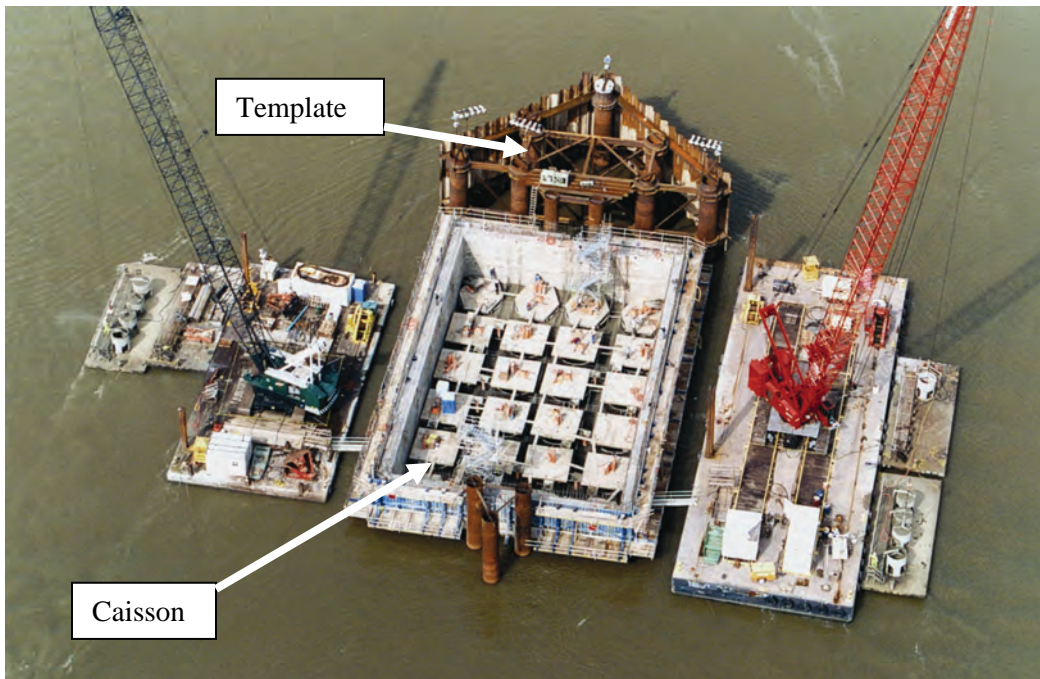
Caisson Construction for Greenville Bridge (Jacobson, 2007)
